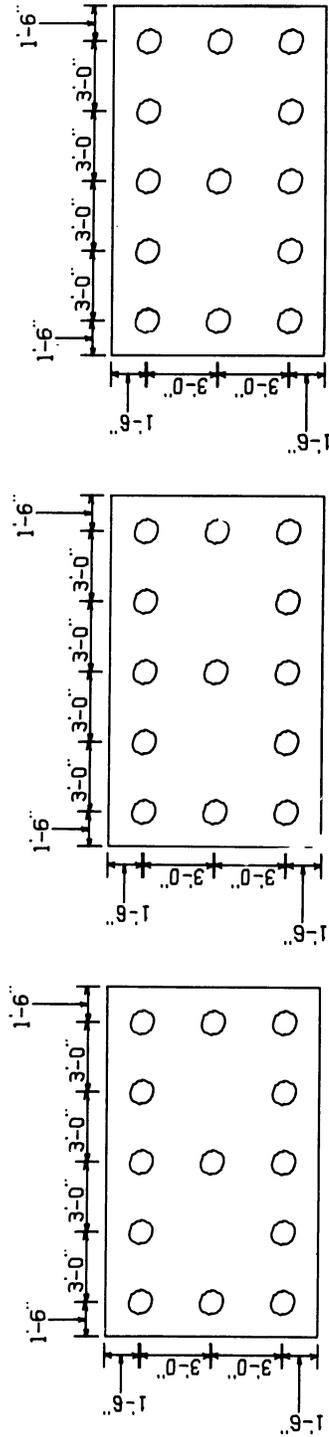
Footings and pile details designed and plotted by BEST system for one of the piers.
